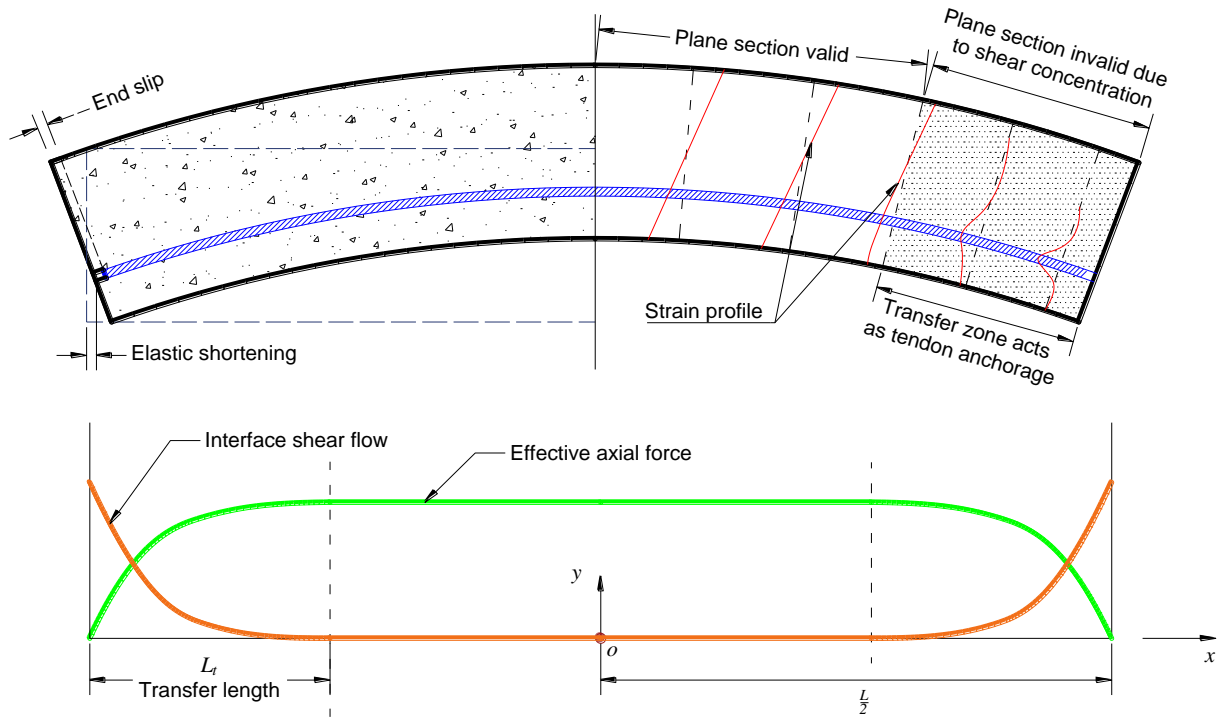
Prestressed concrete and force equilibrium in pretensioned concrete girder
